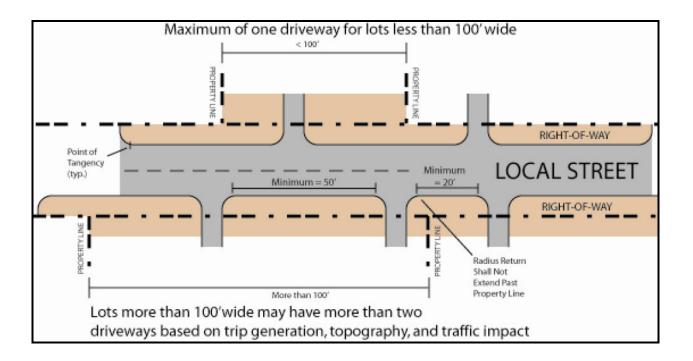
(3)c - Local Street Driveway Spacing Criteria
